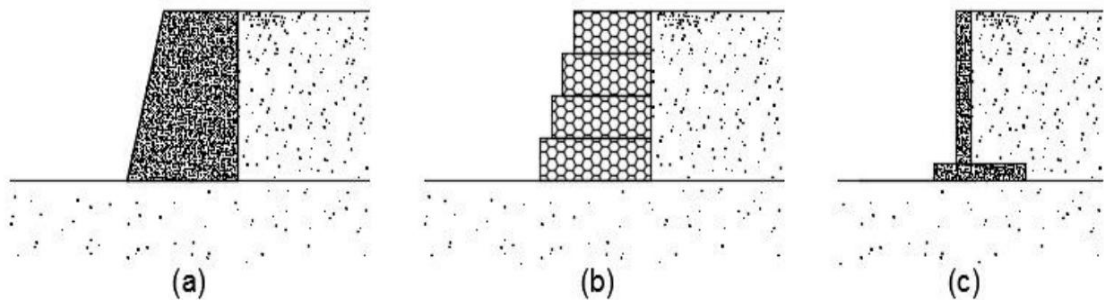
Retaining wall types (a) Gravity wall, (b) Gabion wall and (c) Cantilever
